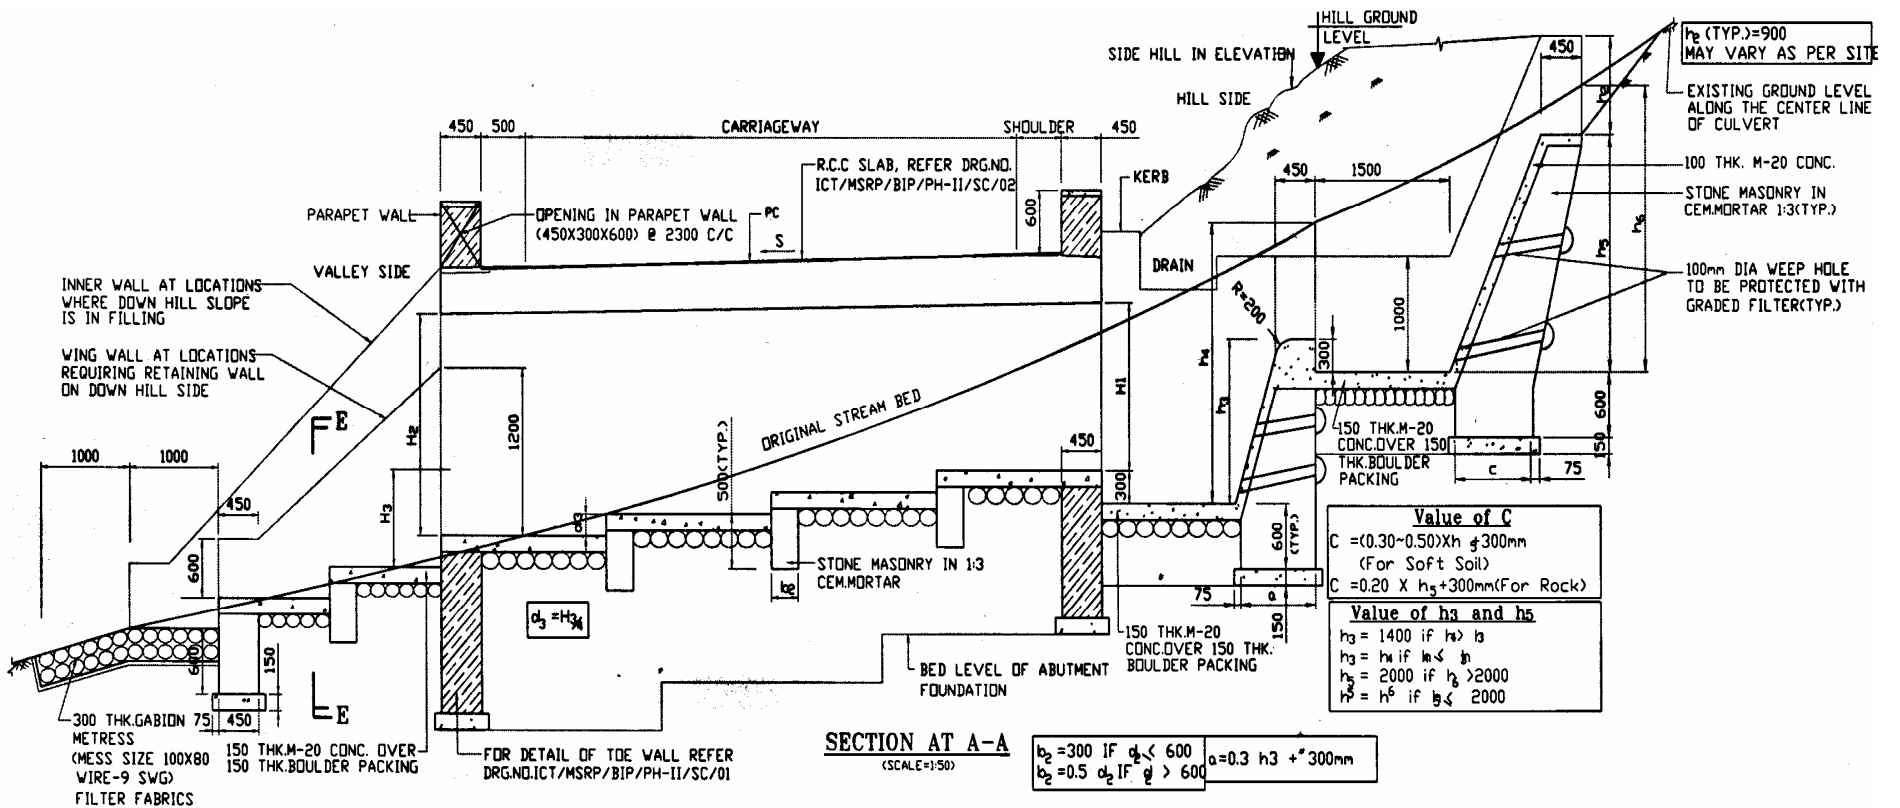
Showing Improved Inlet and Outlet Transitions for Slab Culverts
